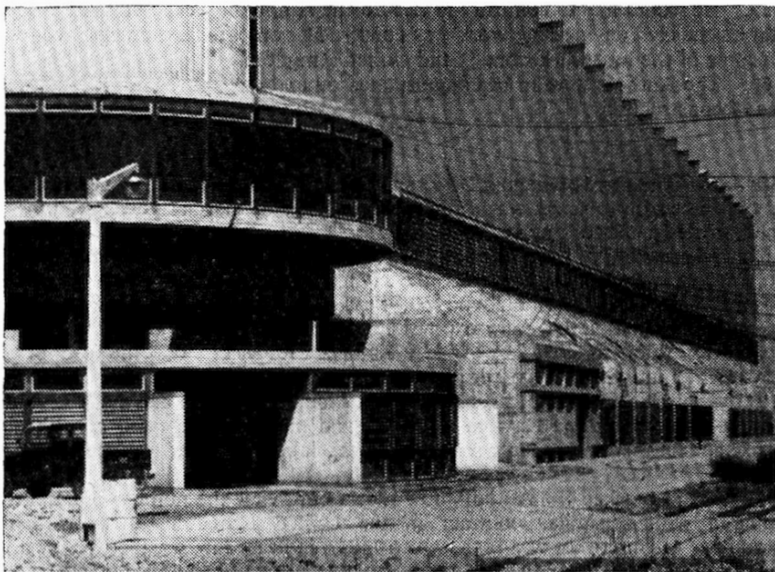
WEST ELEVATION OF THE TURBINE HALL AND CIRCULAR CONTROL TOWER
